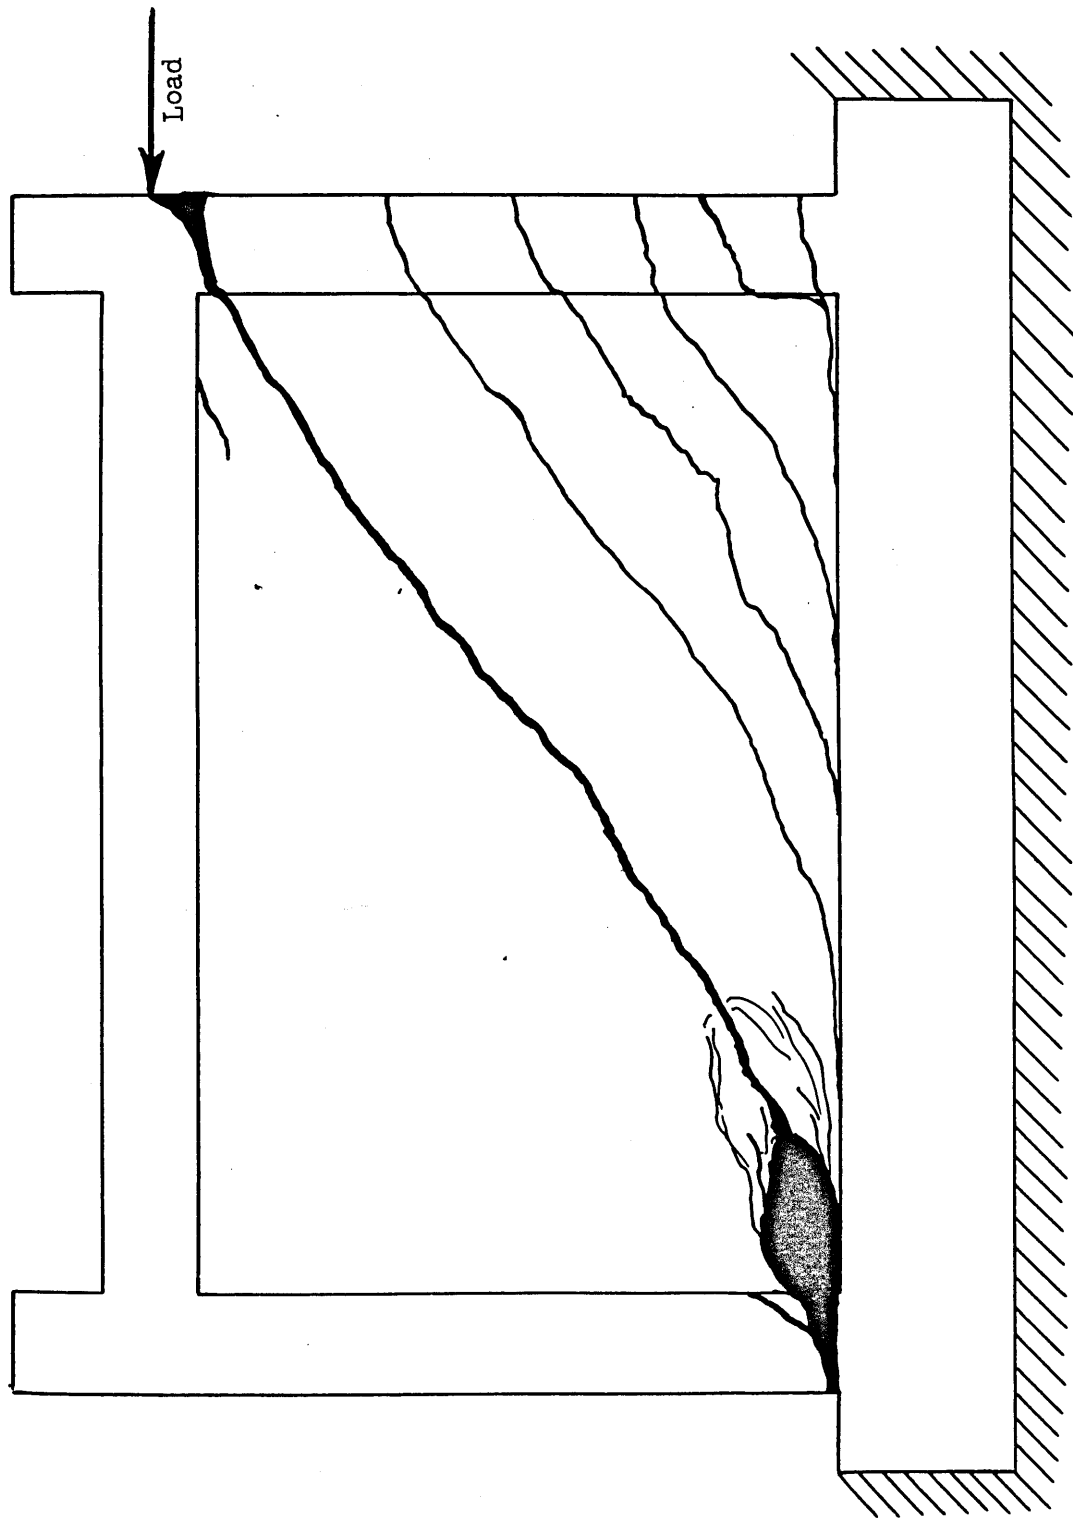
Shear Wall - Shear Failure at the Base of Compression Column
